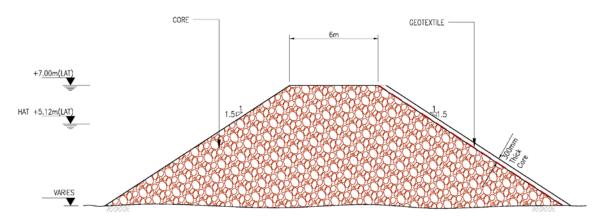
Western Basin Expansion typical section of bund wall – core material and geotextile (bund wall type B2)
